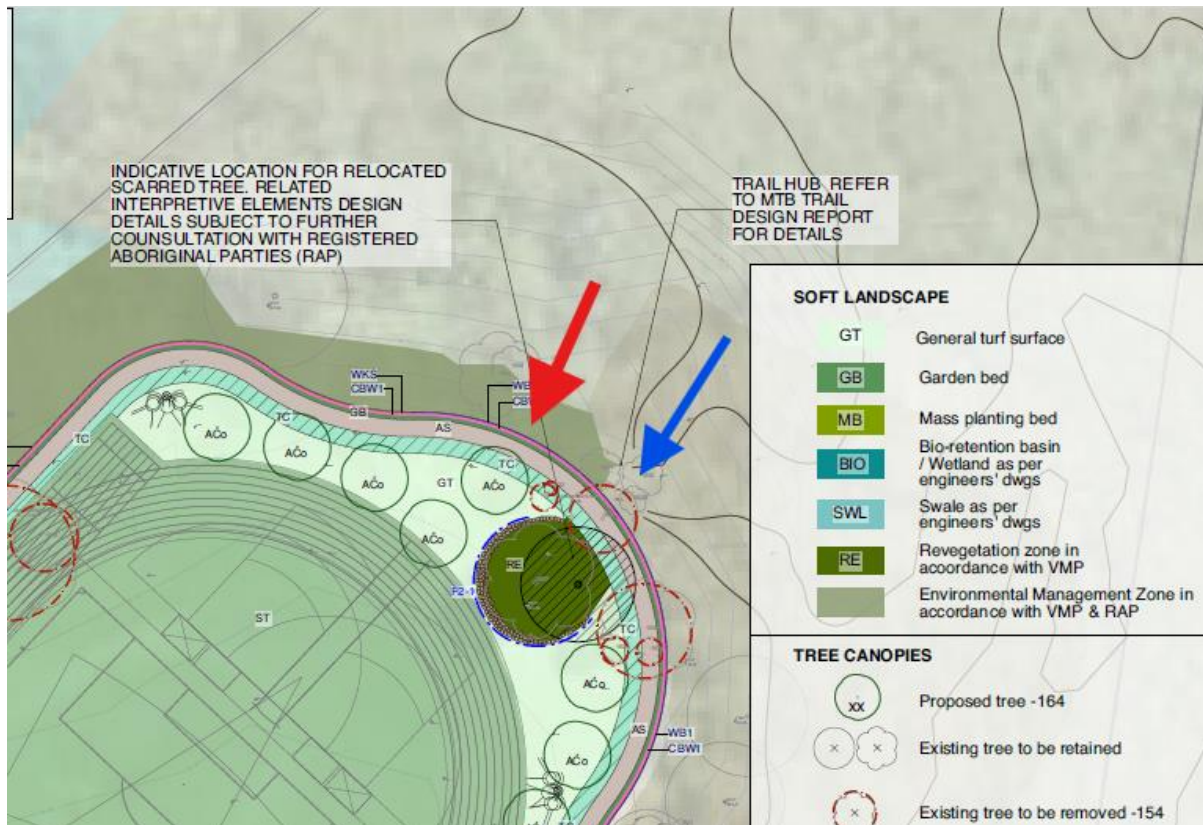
Extract of Drawing 3707.GA.07 Issue 10 in the Landscape Plans (Source: Environmental Partnership)
